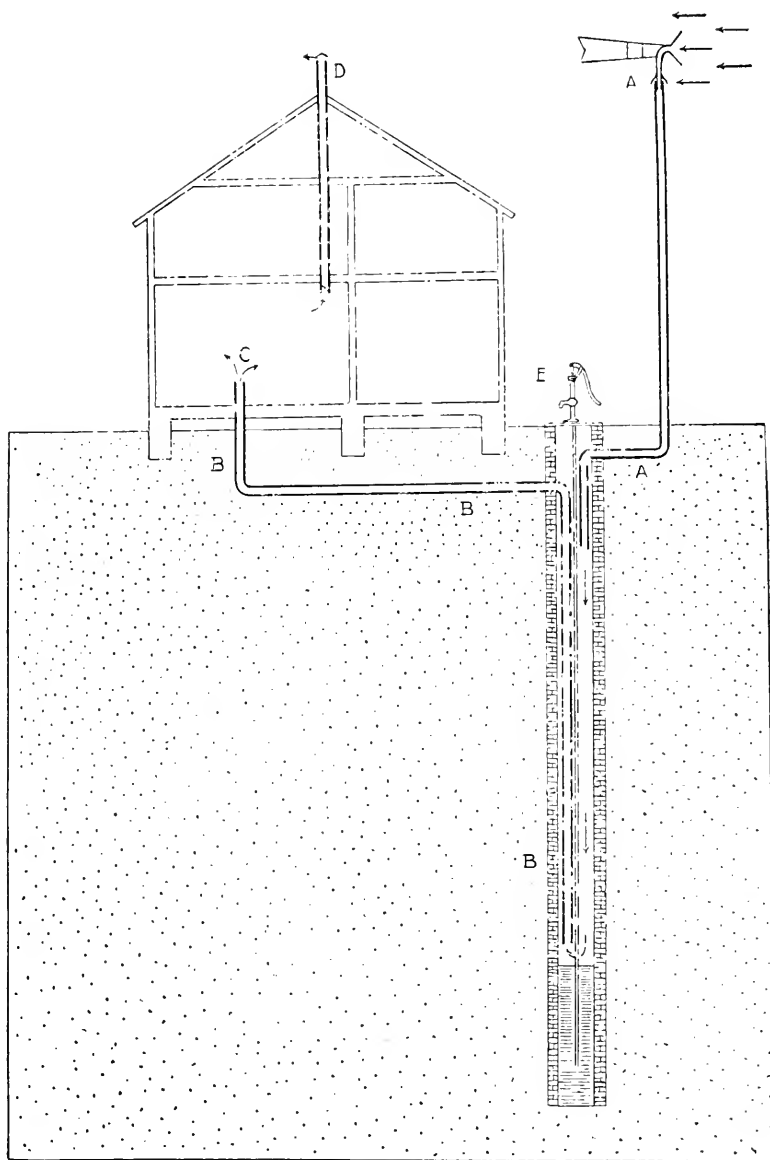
Plate XI.—Showing vertical section of factory and sub-earth duct in well. A, A, funnel taking air into well; B, B, duct leading air from wall to curing room, C; D, ventilator. (From Wis. Agr. Exp. Sta. Bul. 70.)
